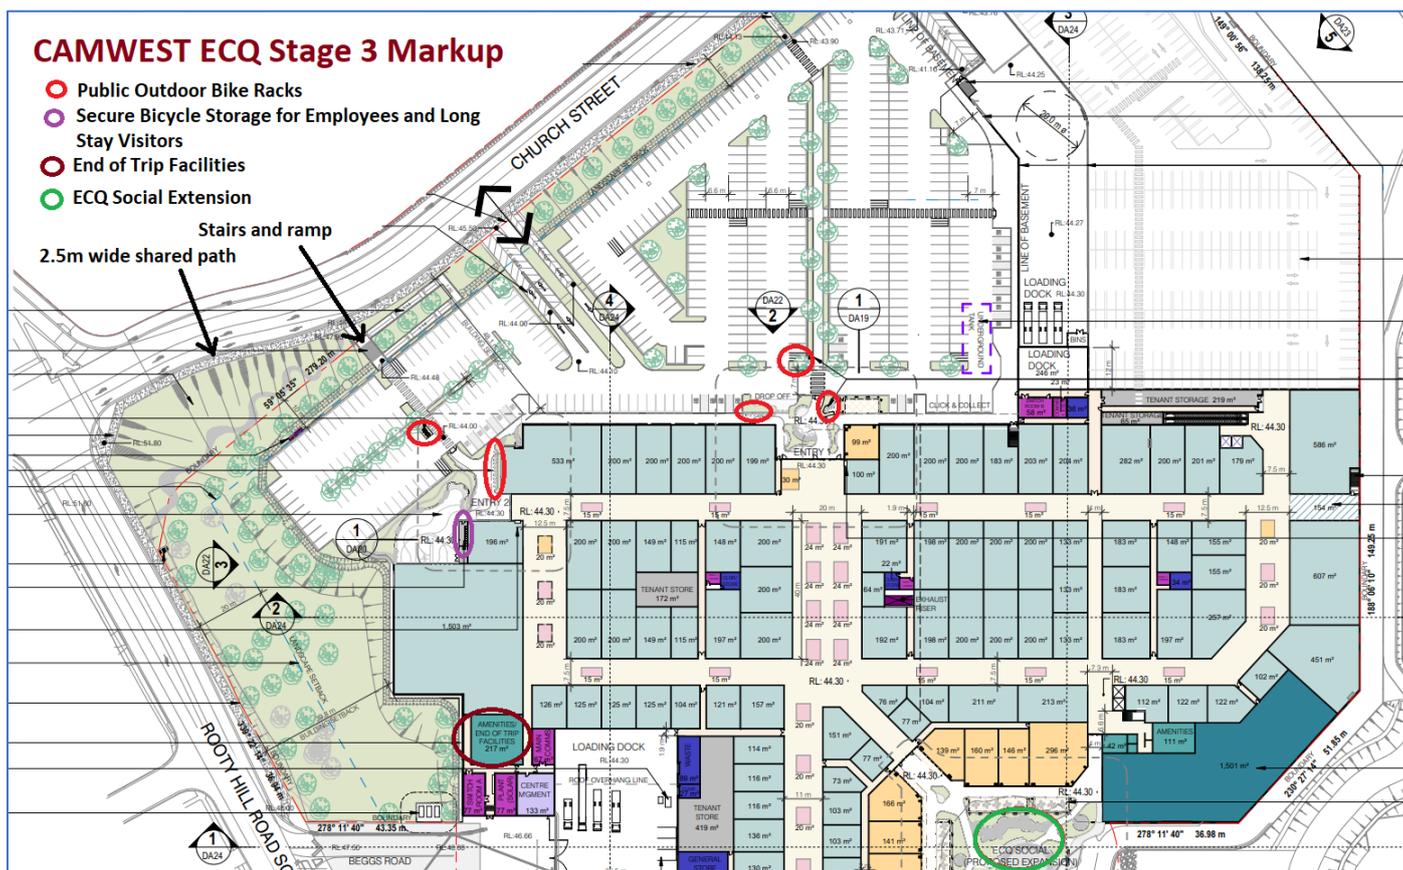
Marked up partial copy of 'Stage 3 Proposed Floor Plan', page 15 of Appendix D - Architectural Drawings
